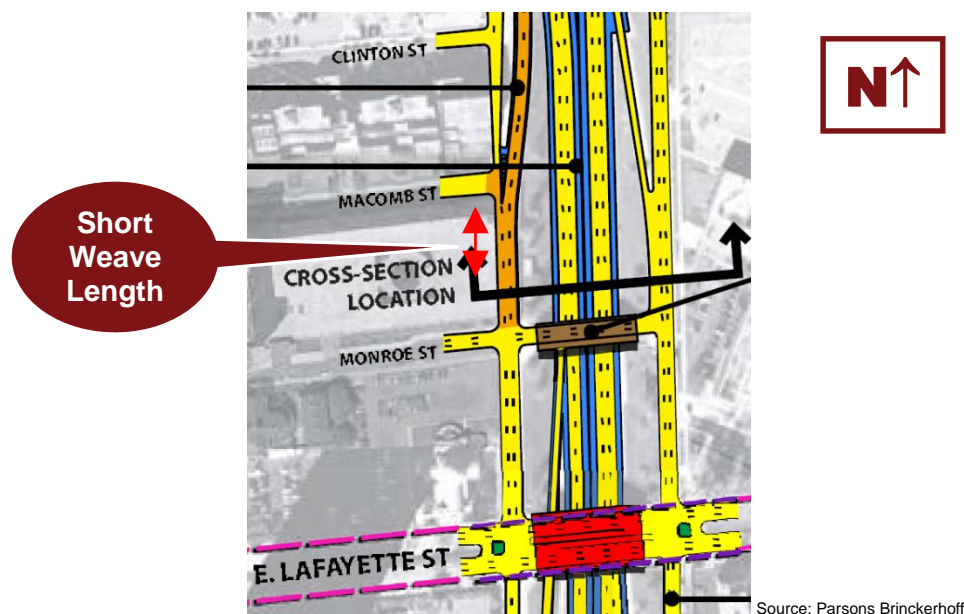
SB I-375 off Ramp Weave at Lafayette St
